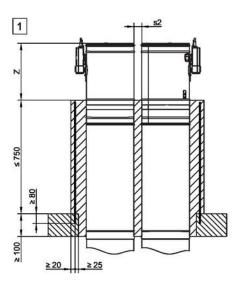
Mortar-based installation into the concrete base – multiple occupancy of an installation opening
